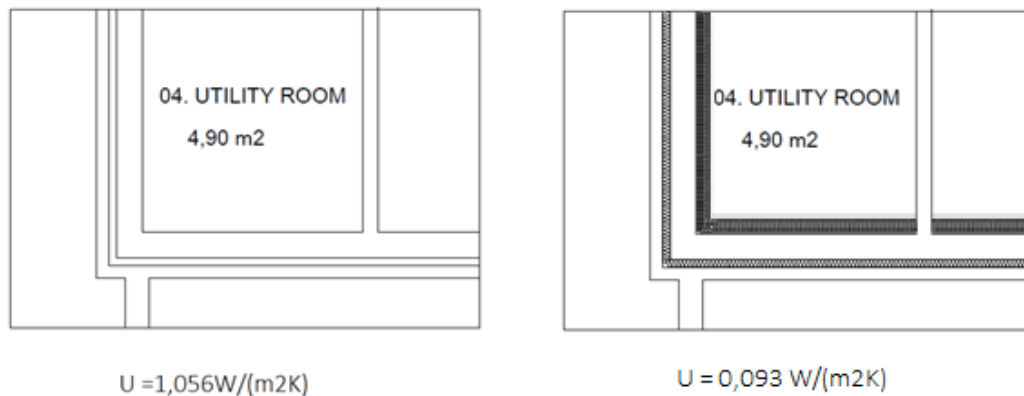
Part plan of corner of north and east exterior wall before (on the left) and after (on the right) thermomodernization.
